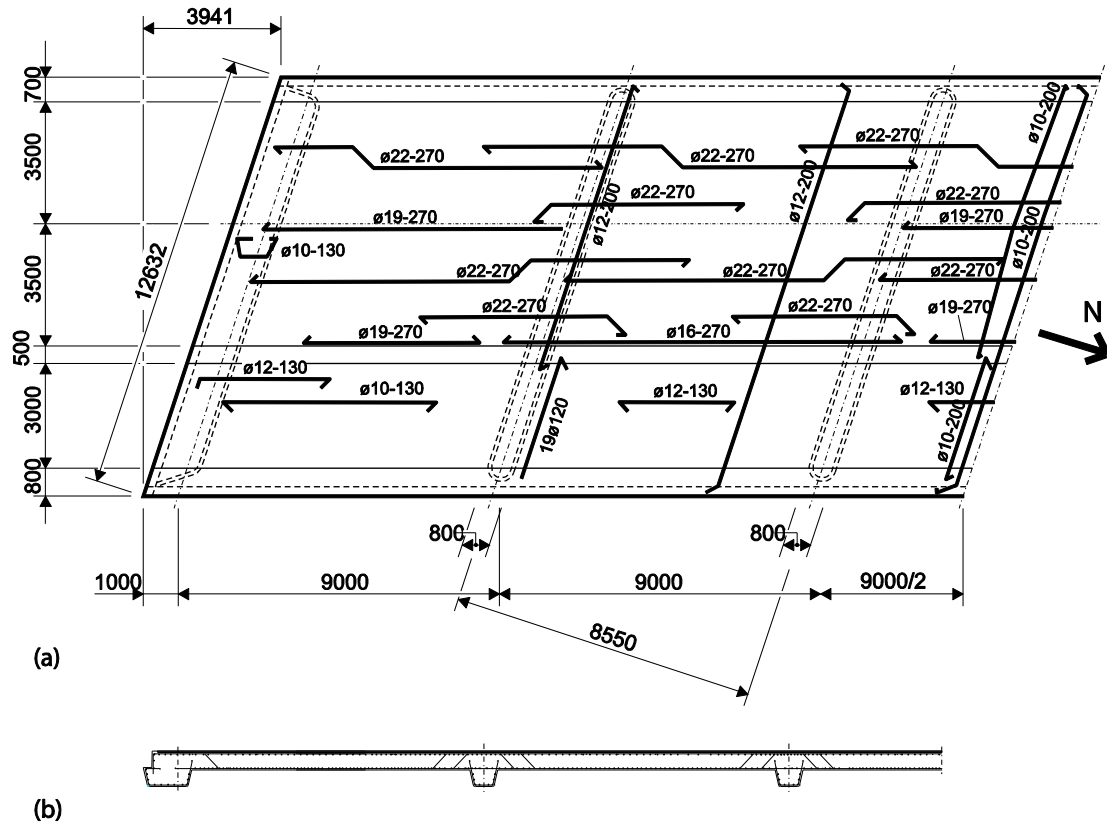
shows a plan view and cross-section of the reinforcement layout. An overview of the available reinforcement is given in Table 2. In span 1, 2 layers of  $\phi = 22$  mm with a spacing of 270 mm and 1 layer of  $\phi = 19$  mm with a spacing of 270 mm is available, so that  $A_s = 3866 \text{ mm}^2/\text{m}$  in span 1. In span 2, 2 layers of  $\phi = 22$  mm with a spacing of 270 mm and 1 layer of  $\phi = 16$  mm with a spacing of 270 mm is available, so that  $A_s = 3650 \text{ mm}^2/\text{m}$  in span 1. Over support 2, 4 layers of  $\phi = 22$  mm with a spacing of 270 mm are available, so that  $A_s = 5632 \text{ mm}^2/\text{m}$  over support 2. The mentioned layers are in the width direction, reducing the spacing between the bars but not changing the effective depth of the cross-section.
